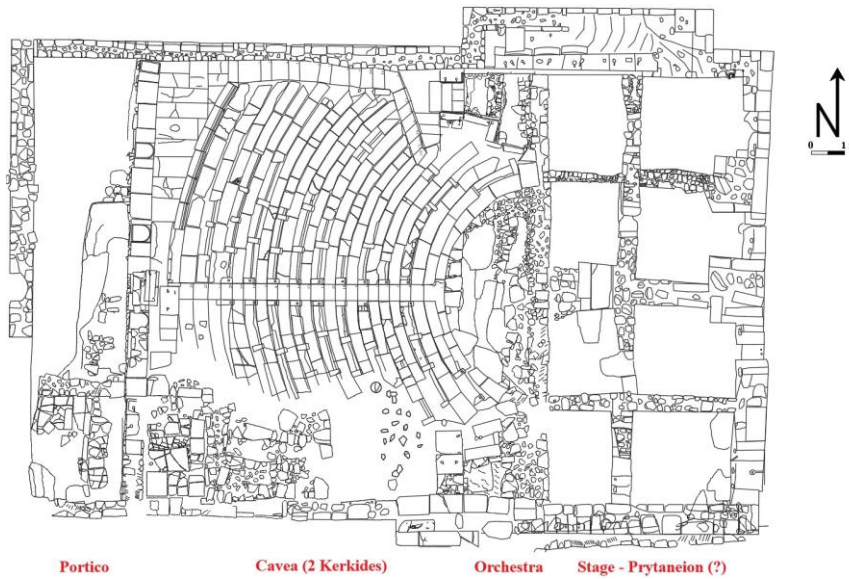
Plan of New Bouleuterion at Aigai (Aigai Excavation Archive)
